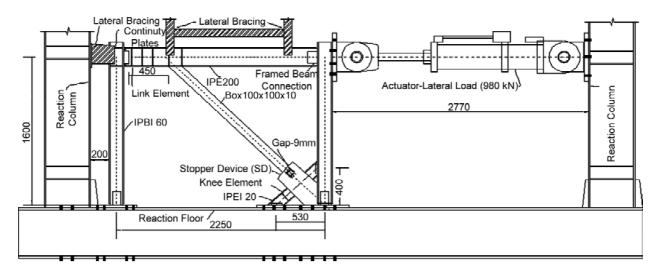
Proof-of-concept test setup with dimensions (elevation).
